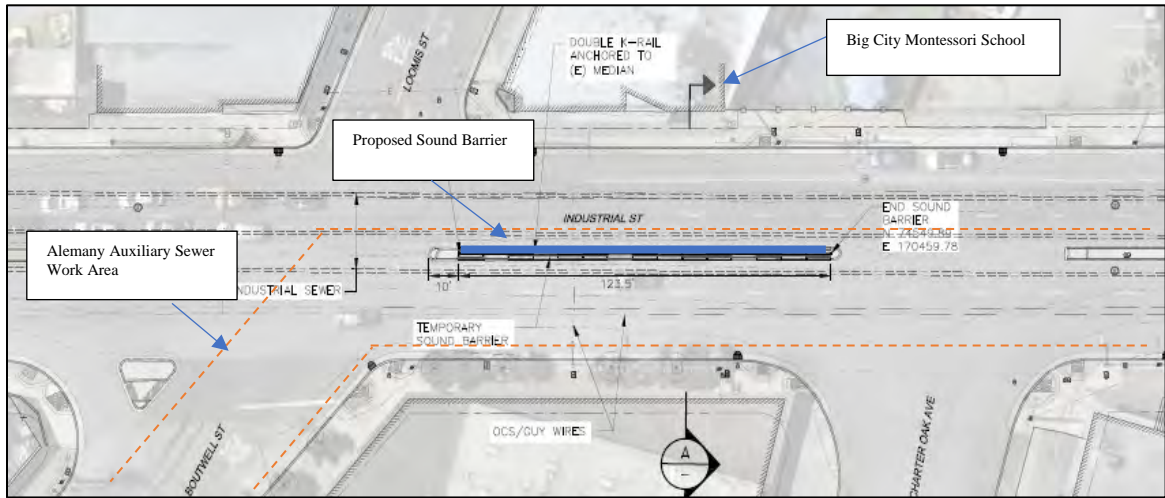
Proposed Temporary Sound Barrier Plan on Industrial Street
